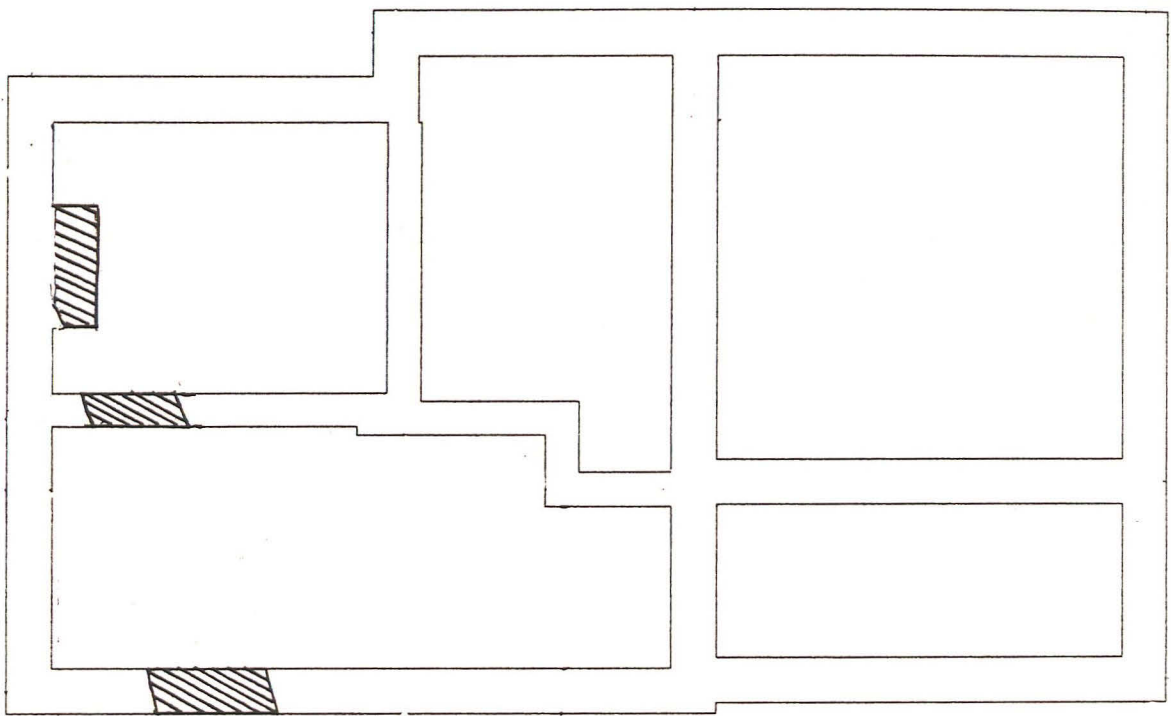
Foundations layout showing position of gully. Scale 1:100. (Based on plan supplied by Mr D.Andrew).
